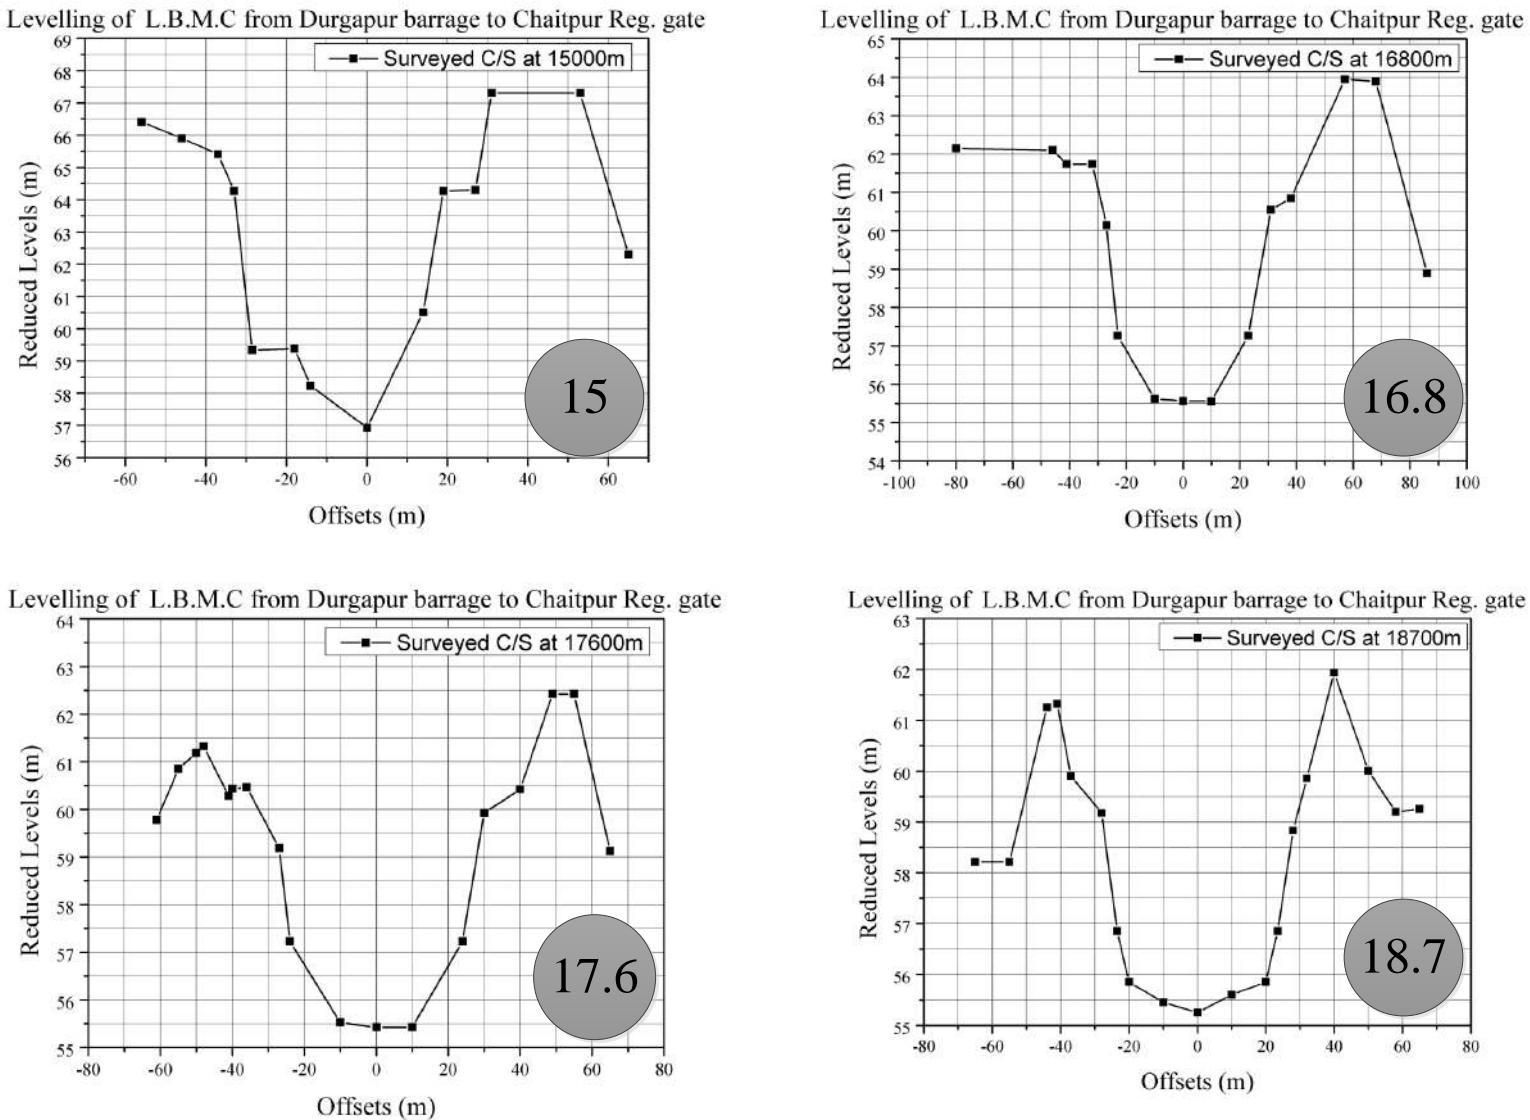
Canal cross section from 15 km to 18.7 km on Left Bank Main Canal
